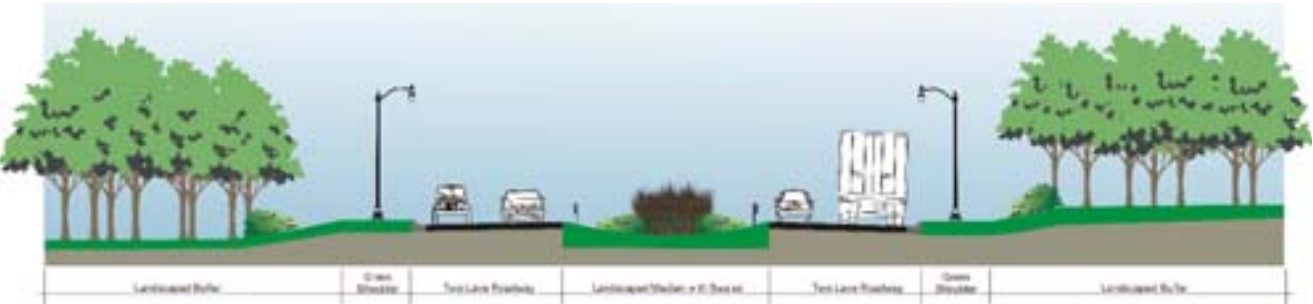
Typical Cross-Section Between Pennsylvania Avenue and East Capitol Street
